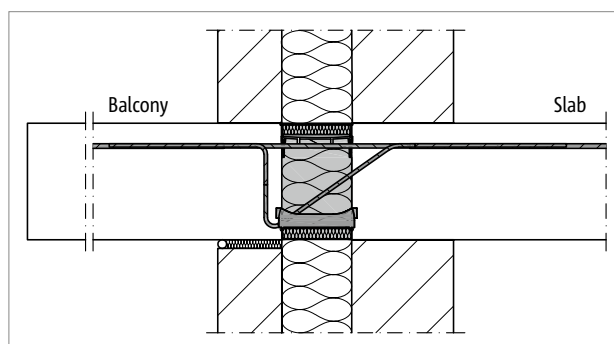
Schöck Isokorb® XT type K: Connection with filled cavity brickwork with core insulation
